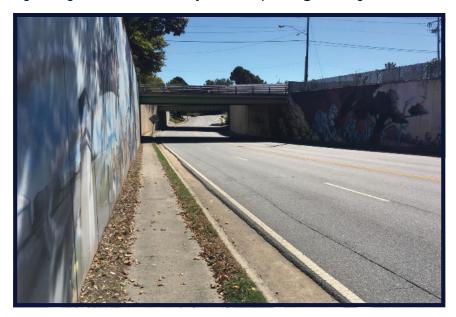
shows the existing conditions of Chamblee Dunwoody Road south of American Industrial Way. This area of the corridor contains art-murals that are difficult to appreciate closely due to limited sidewalk infrastructure and challenging pedestrian conditions.
